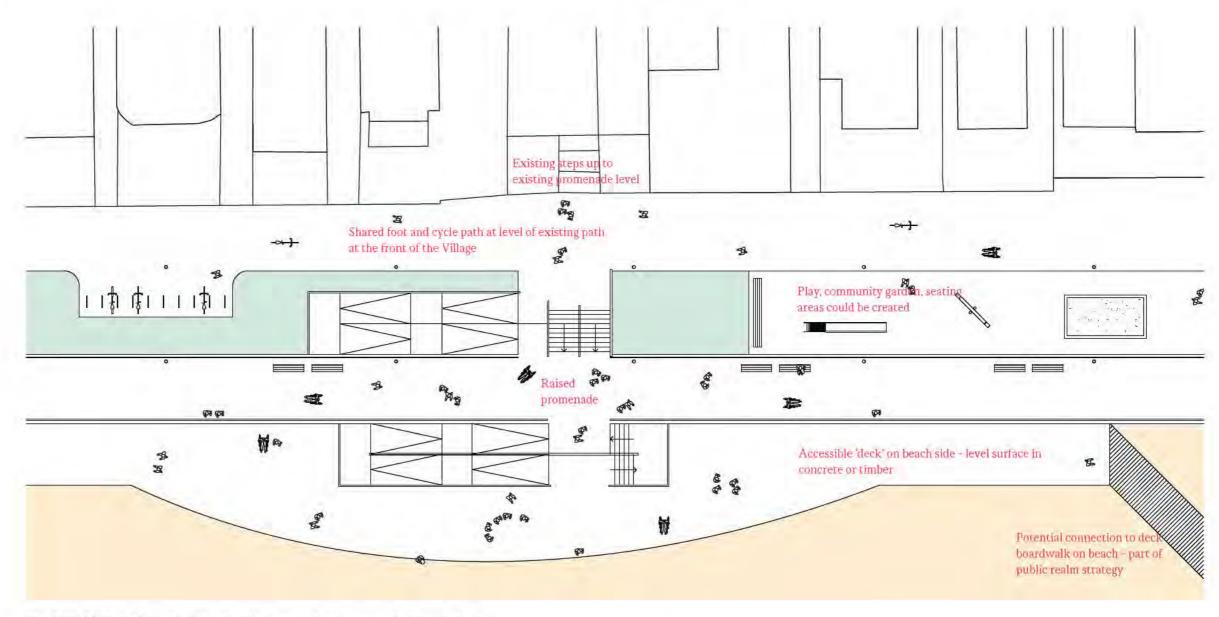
Option B - indicative plan of proposed new sea wall at the Village.
